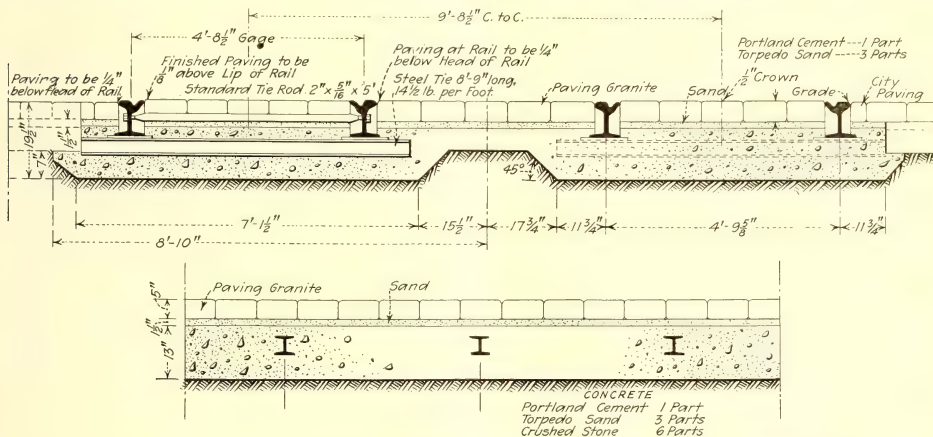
CHICAGO STANDARD TRACK TYPE NO. 1: CONCRETE FOUNDATION AND STEEL TIES
